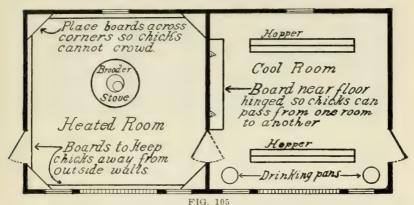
is a ground floor plan of a two-room brooder house. is the ideal house for a coal heater or oil heated stove. The stove should be near the center of the heated room. Boards should be placed around the wall of this room to protect the chicks from cold and drafts, and across the corners so there will be no sharp corners for them to crowd into. You will note that the door in the partition swings both ways, and the board near the floor is for the free passage of the chicks. We recommend the use of sand on the floor of the room in which the stove is located, and straw litter or clover chaff in the cool room. The drinking pans should be raised a trifle from the floor so trash cannot be scratched into them. This method of brooding affords ideal conditions for the chicks. hundred and fifty to seven hundred and fifty chicks kept under such conditions will do equally as well, or if properly fed and looked after will lose even a less per cent than where they are brooded with hens. If the rooms are 14 feet square or larger, a brooder stove can be used in each room. Where you use a brooder stove in each room, place the stove in one corner or at the back of the room.
